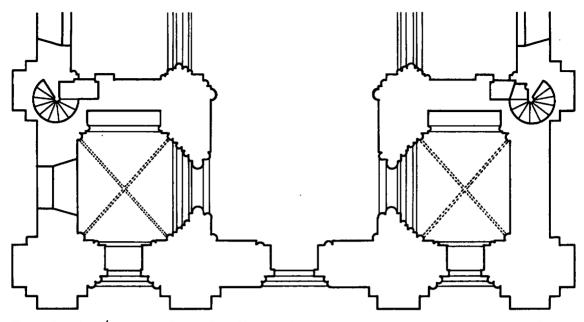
Caen, Saint-Étienne. Plan of ground floor of facade-block as originally built (author's restoration: drawing by K L Clark)
